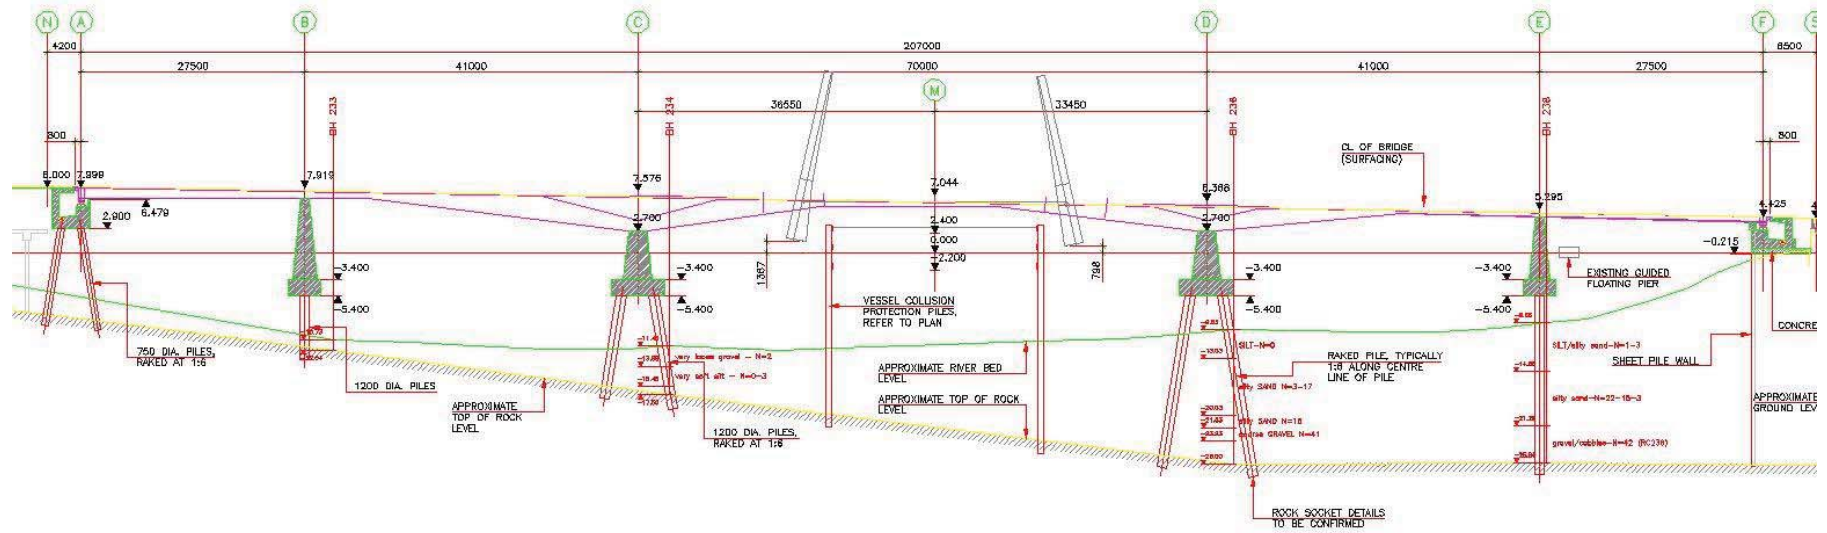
Section of Proposed Bridge showing the piled abutments and the four piled piers, anti-collision fenders and the vertical lift section.
